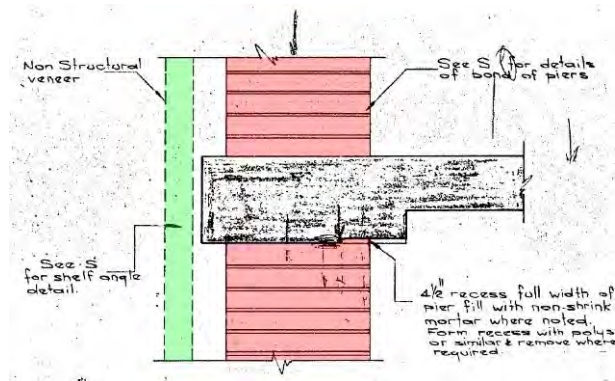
A vertical section showing the arrangement of the masonry and reinforced concrete slab. Shaded in red indicates the loadbearing masonry and in green indicates non-loadbearing brick veneer. The writings on the left-hand side note: 'non-structural veneer' and 'see [section] for shelf angle detail'. (Source: Buchan, Laird & Buchan 1971 [copyright](#))
